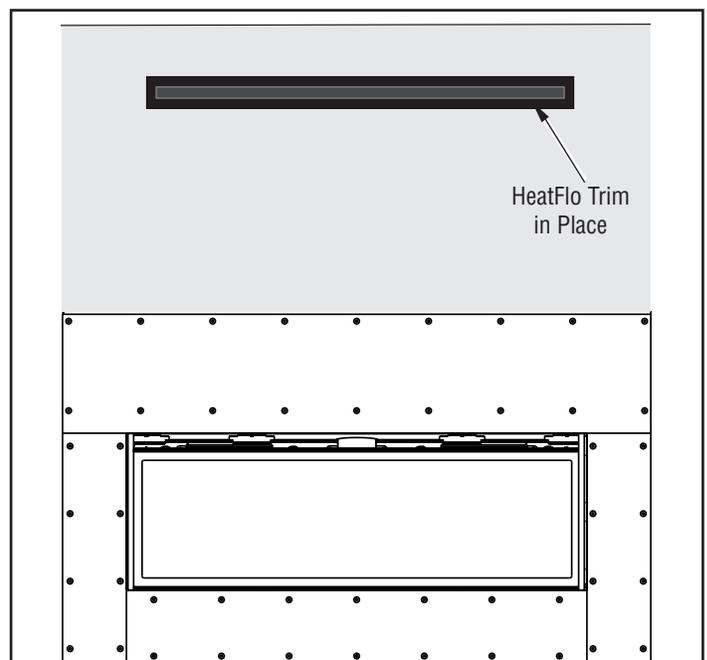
HeatFlo Trim Installed (Flush Wall Shown)
